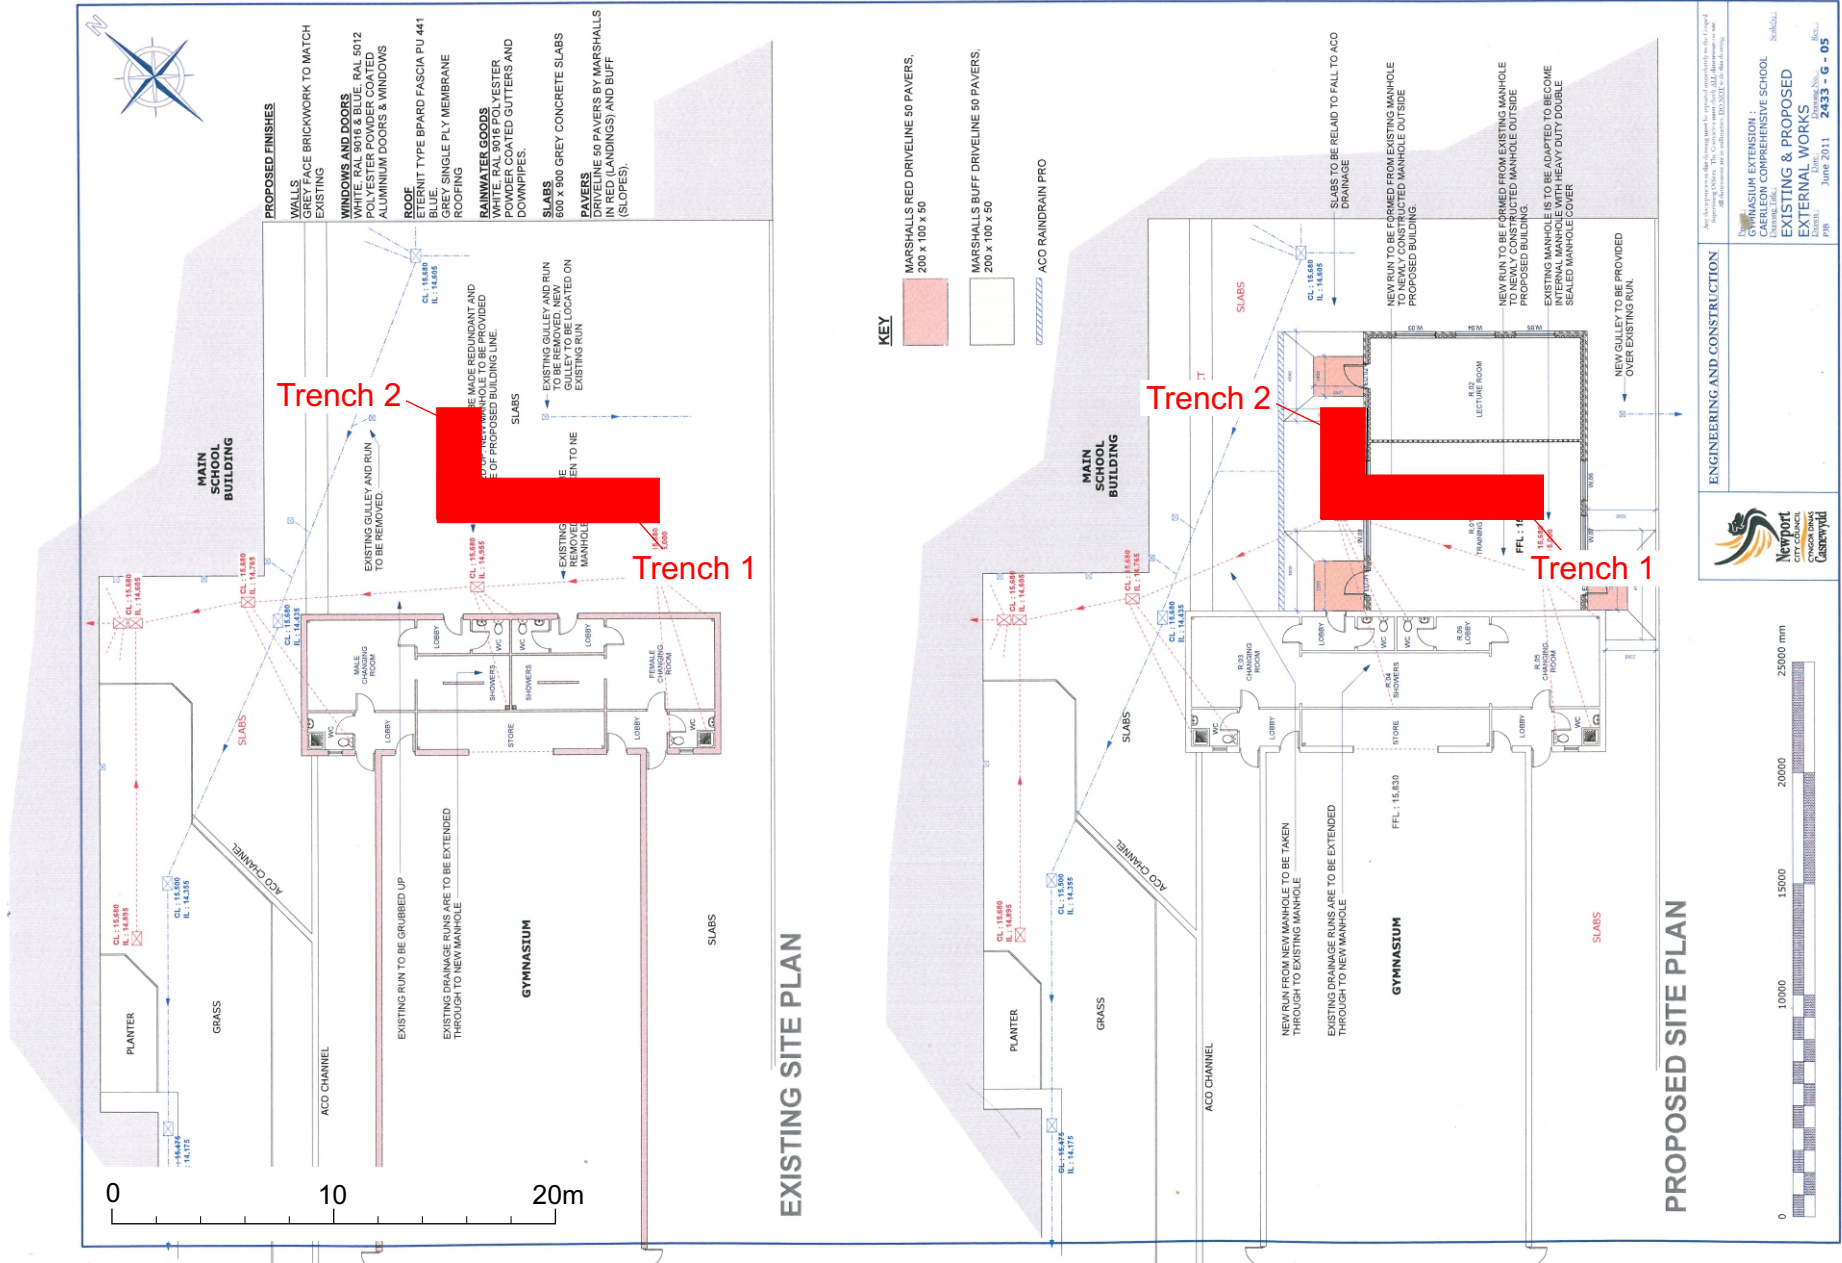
Location of evaluation trenches (red) on the existing and proposed site plans
